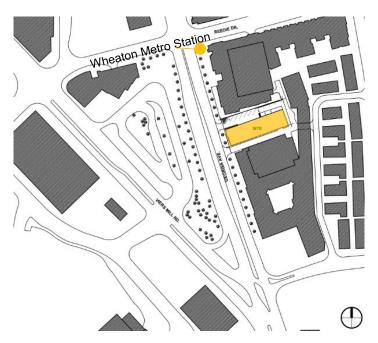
Building Location on Site, Courtesy of Bonstra Haresign Architects
